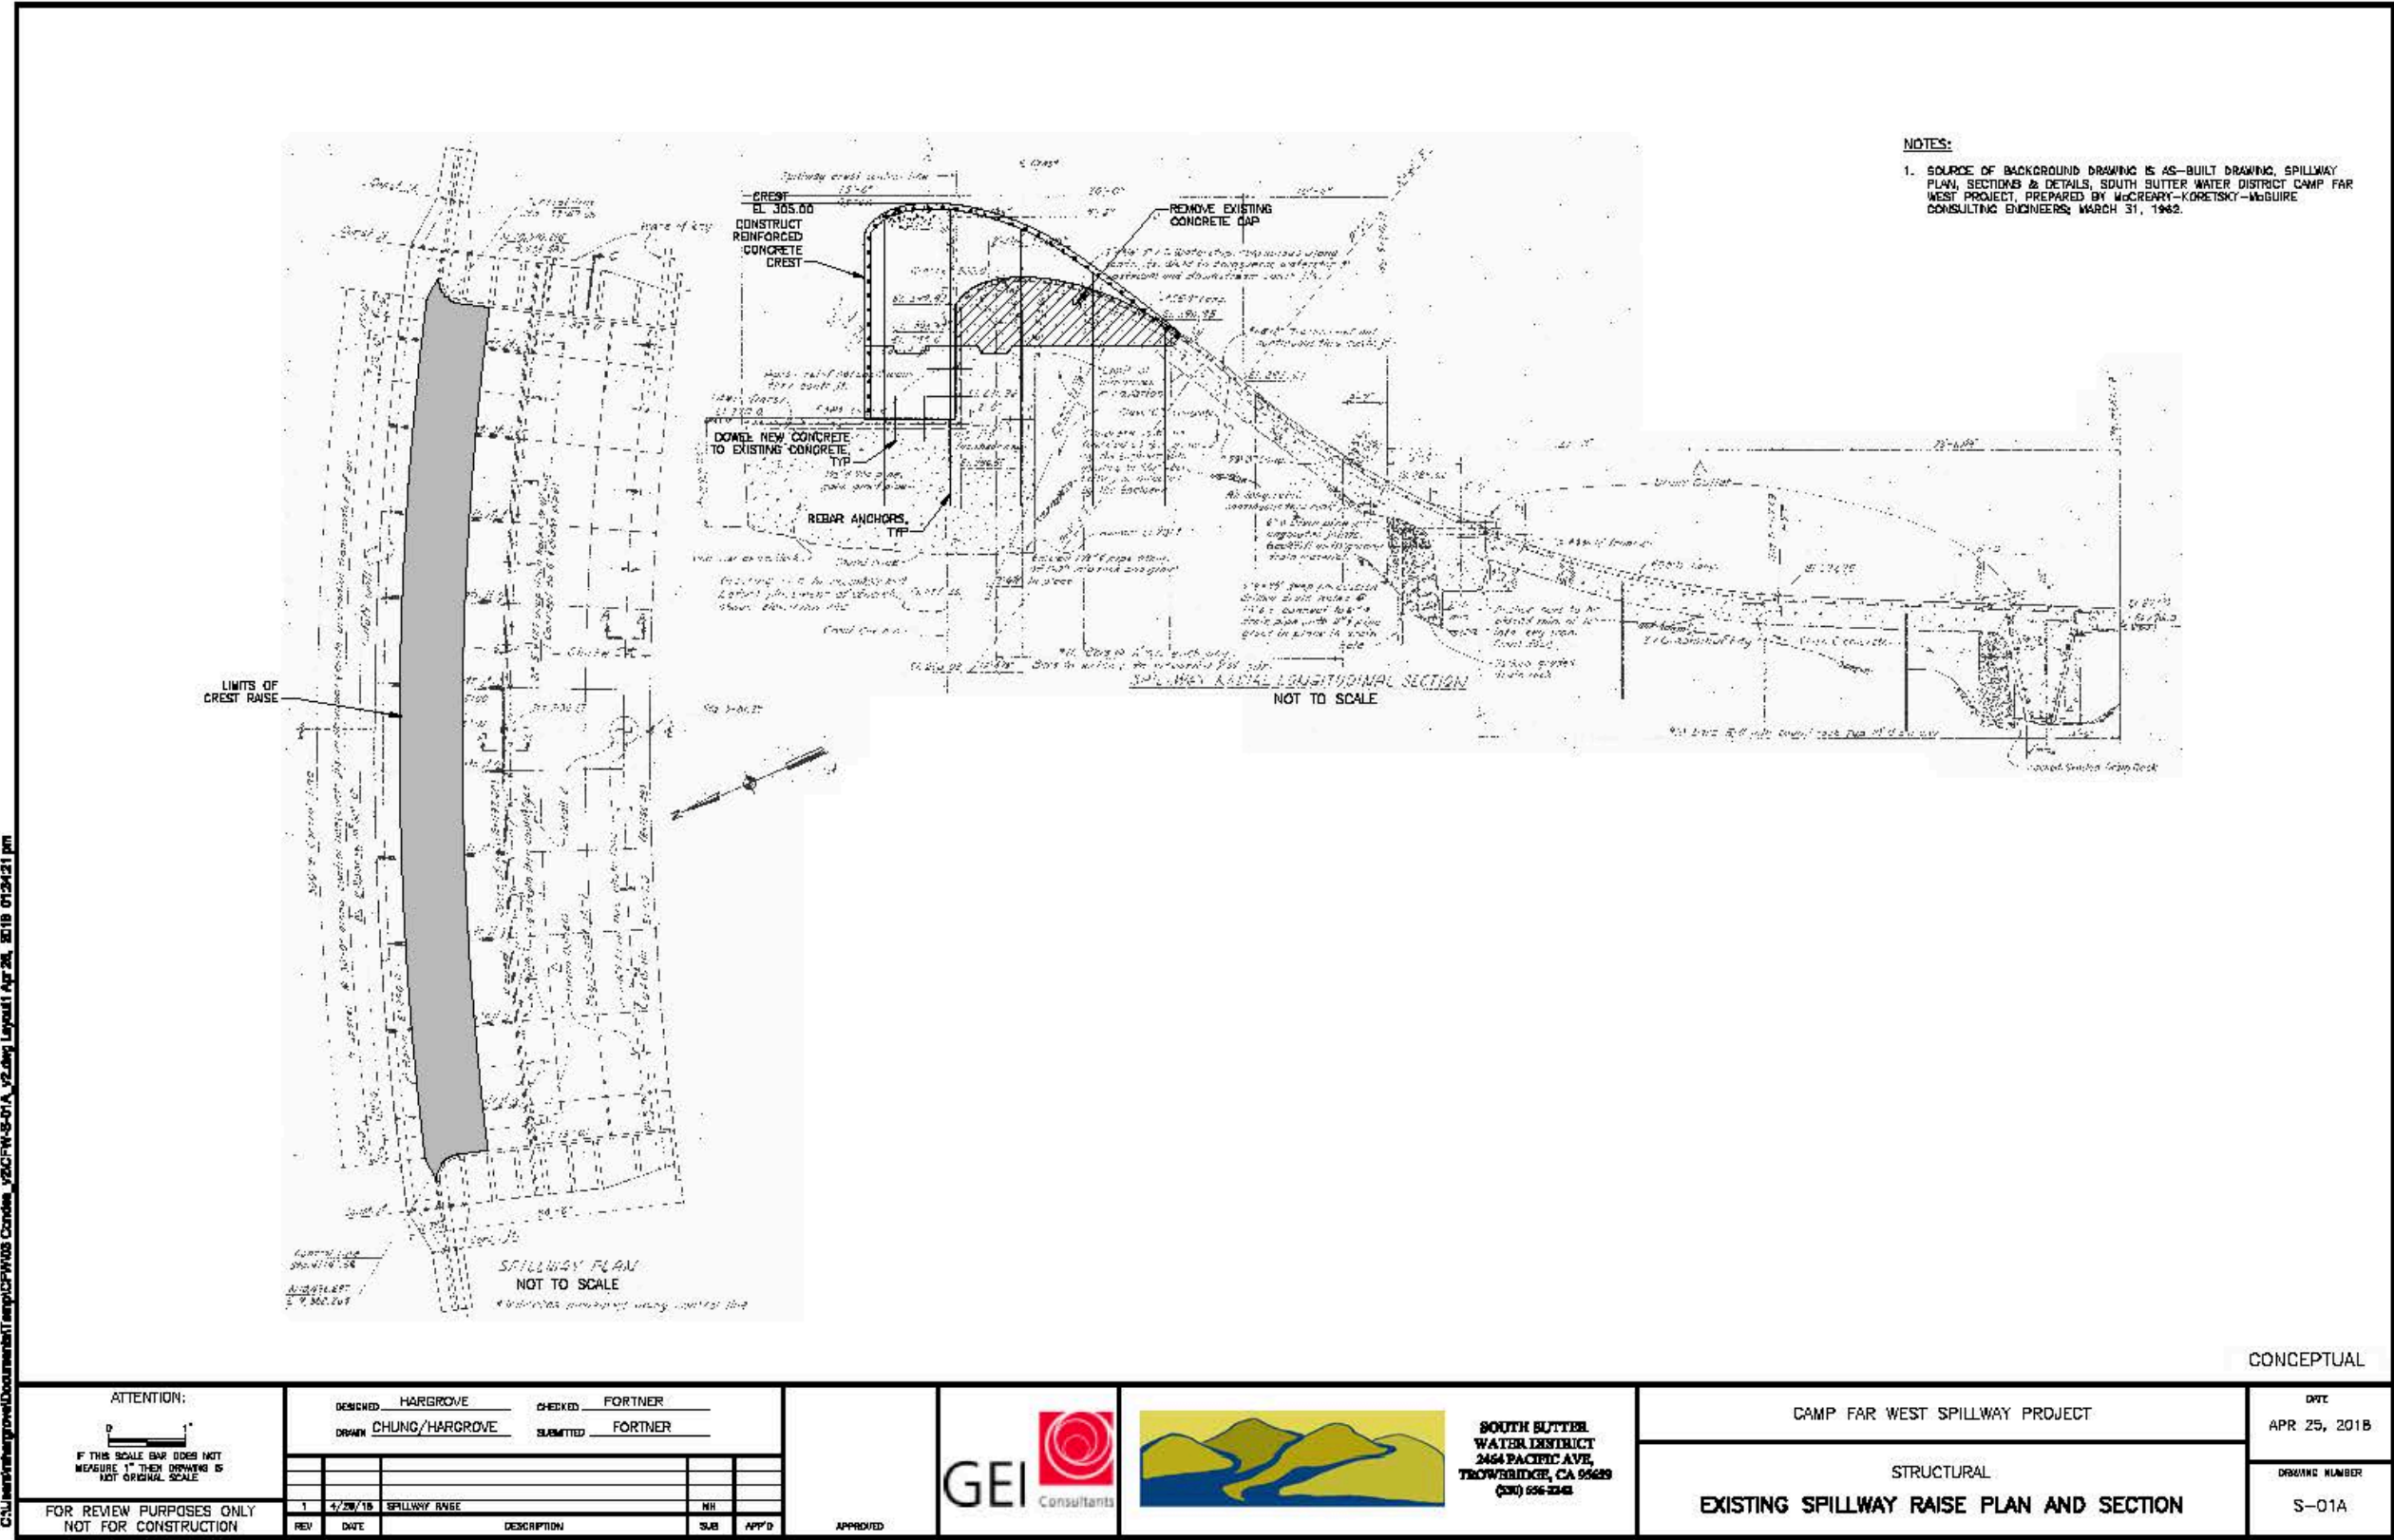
Conceptual level plan for Camp Far West Reservoir Pool Raise - spillway typical section.
